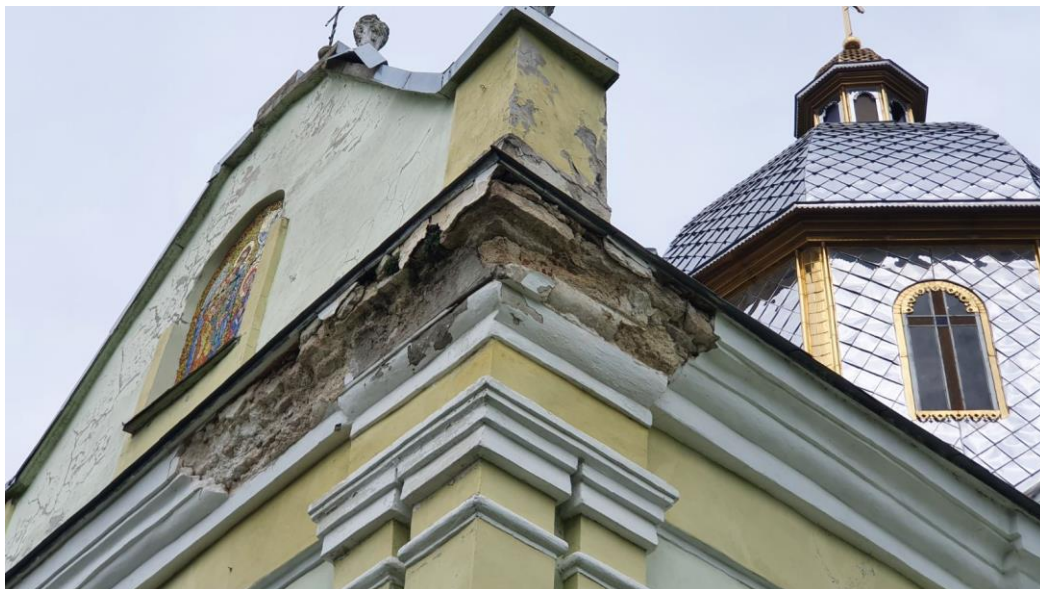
Damage to the cornices on the facade of the building, finishing of the facade and roof elements.
